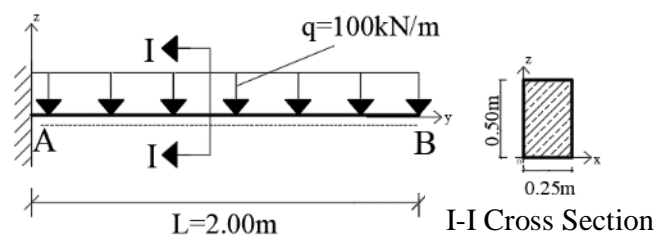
Geometric properties and loading conditions of RC cantilever beam.
